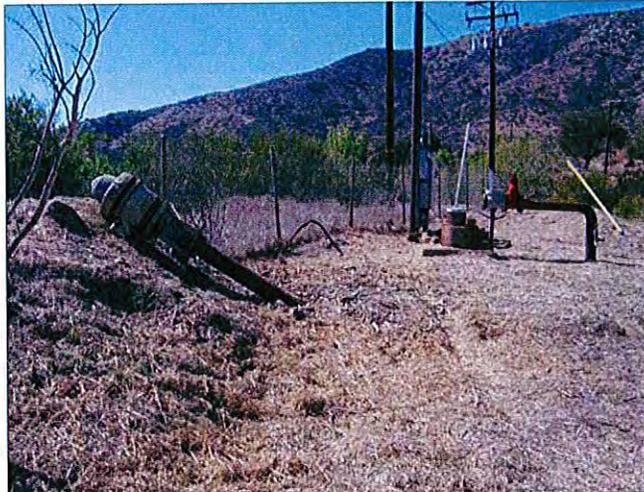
Pump Motor Assembly Removed and Placed by Well.
